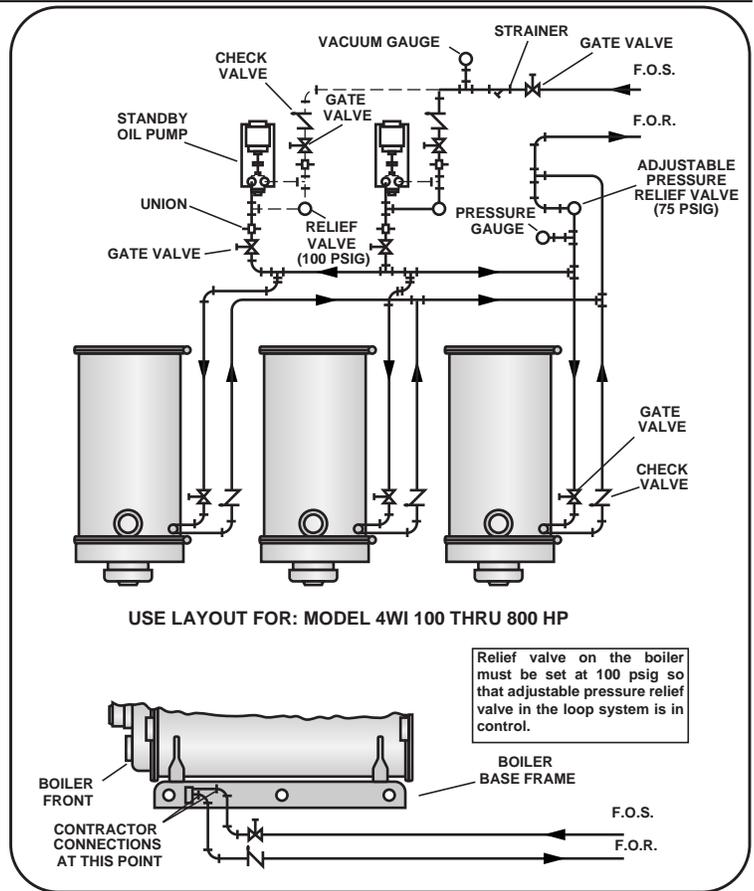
No. 2 Oil Piping, Multiple Boiler Installation
